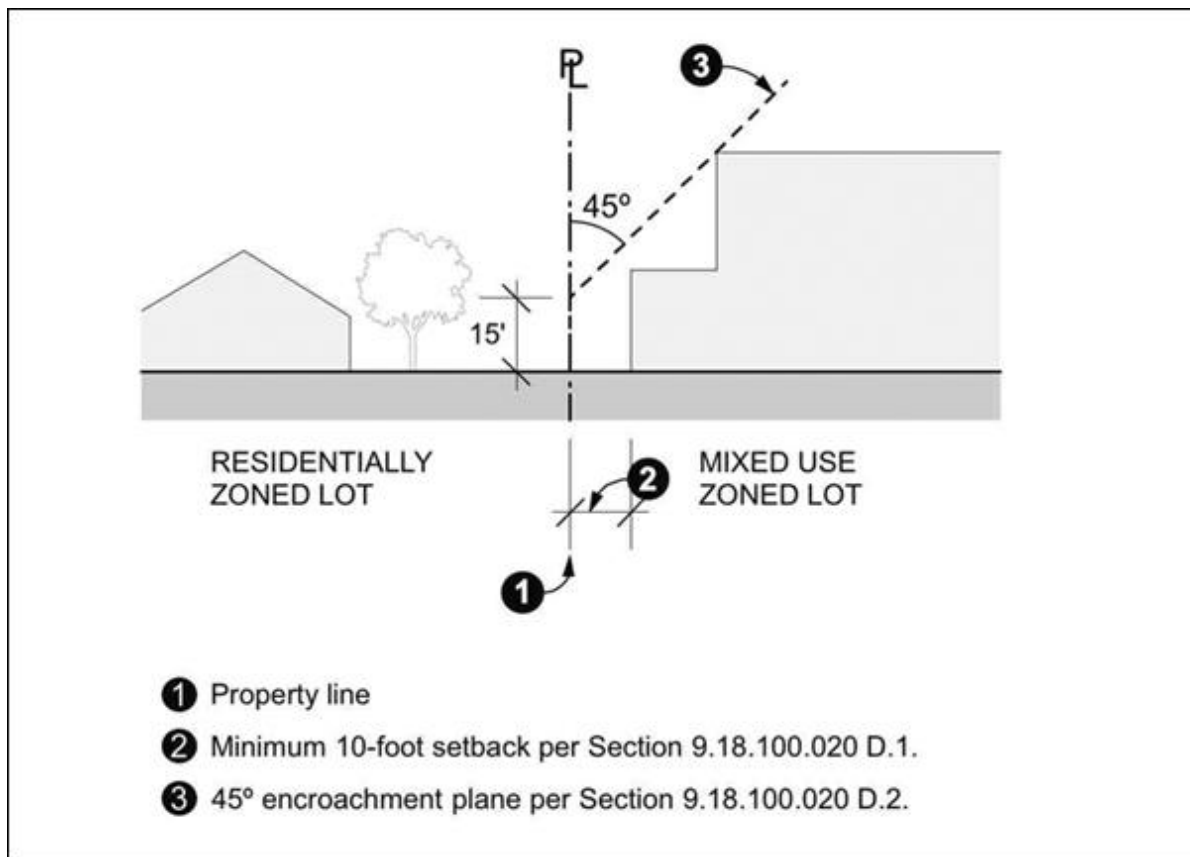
Rear or Side Yard Setback and Encroachment Plane at Residentially Zoned Lot
